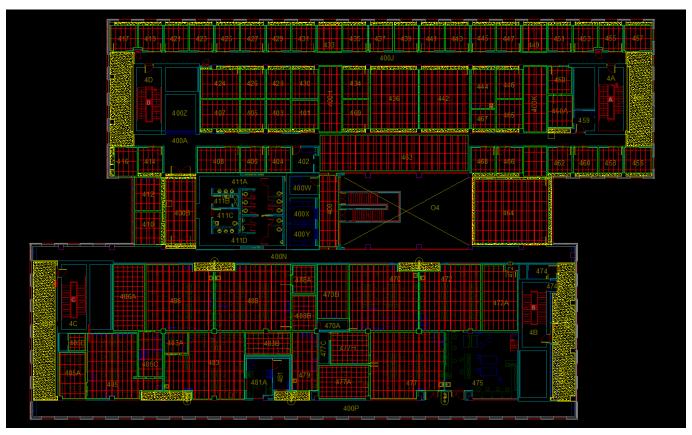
Working AutoCAD file of Reflected Ceiling Plan
